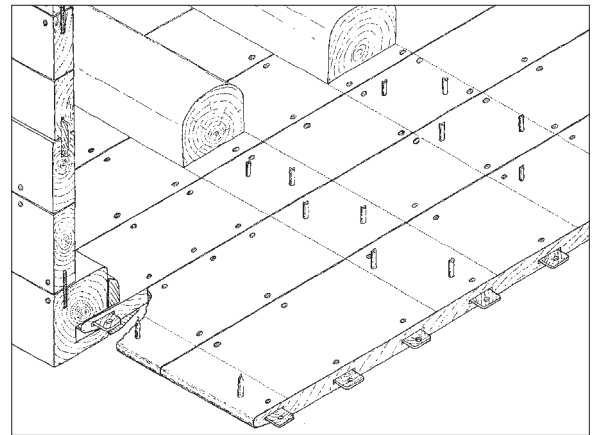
Detail of Area K caisson, junction of chine with end wall and floor planking, caisson K-3, Caesarea (C. J. Brandon).
